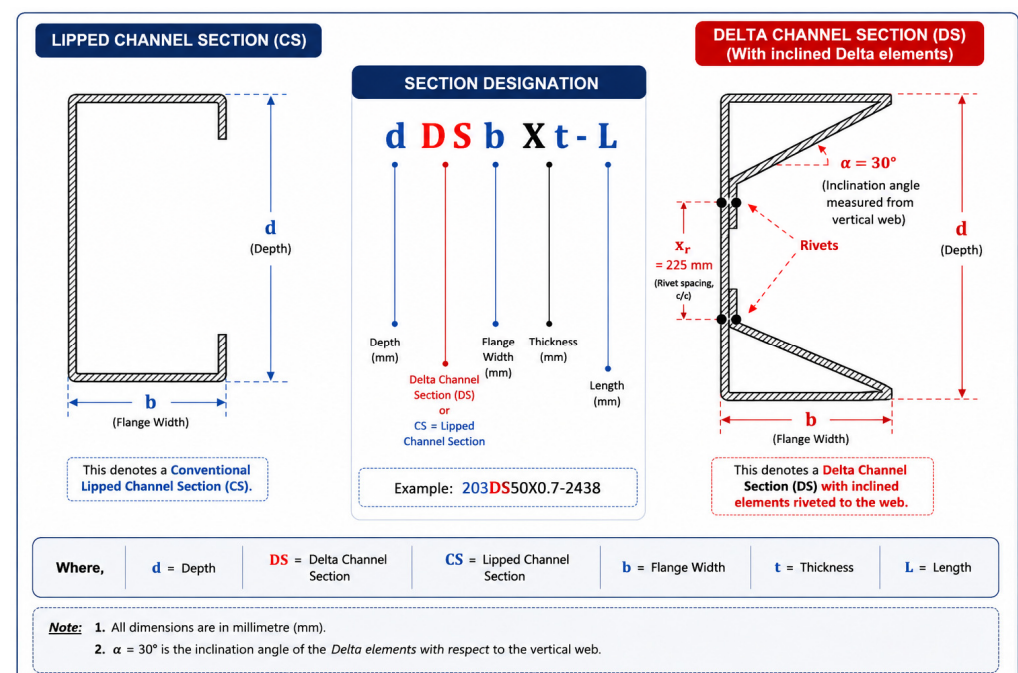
Geometric configurations of the investigated sections: (Left) conventional lipped channel section; (Right) proposed riveted Delta-Channel section.
